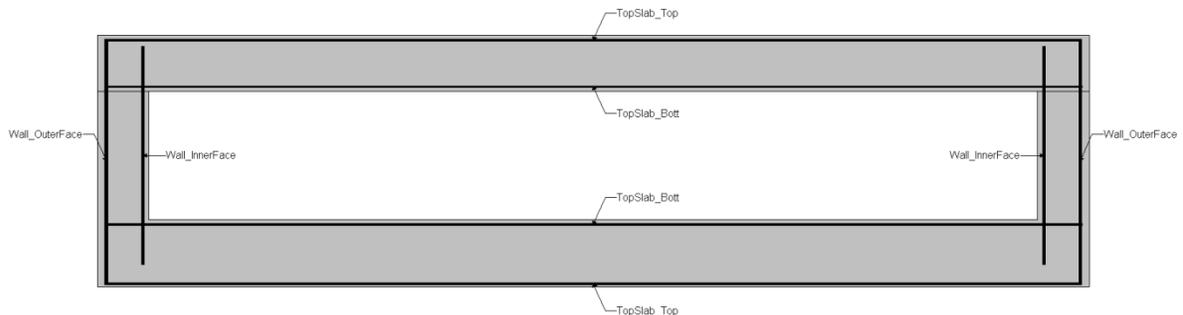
BrR Schematic for Reinforcing Steel Detailing
